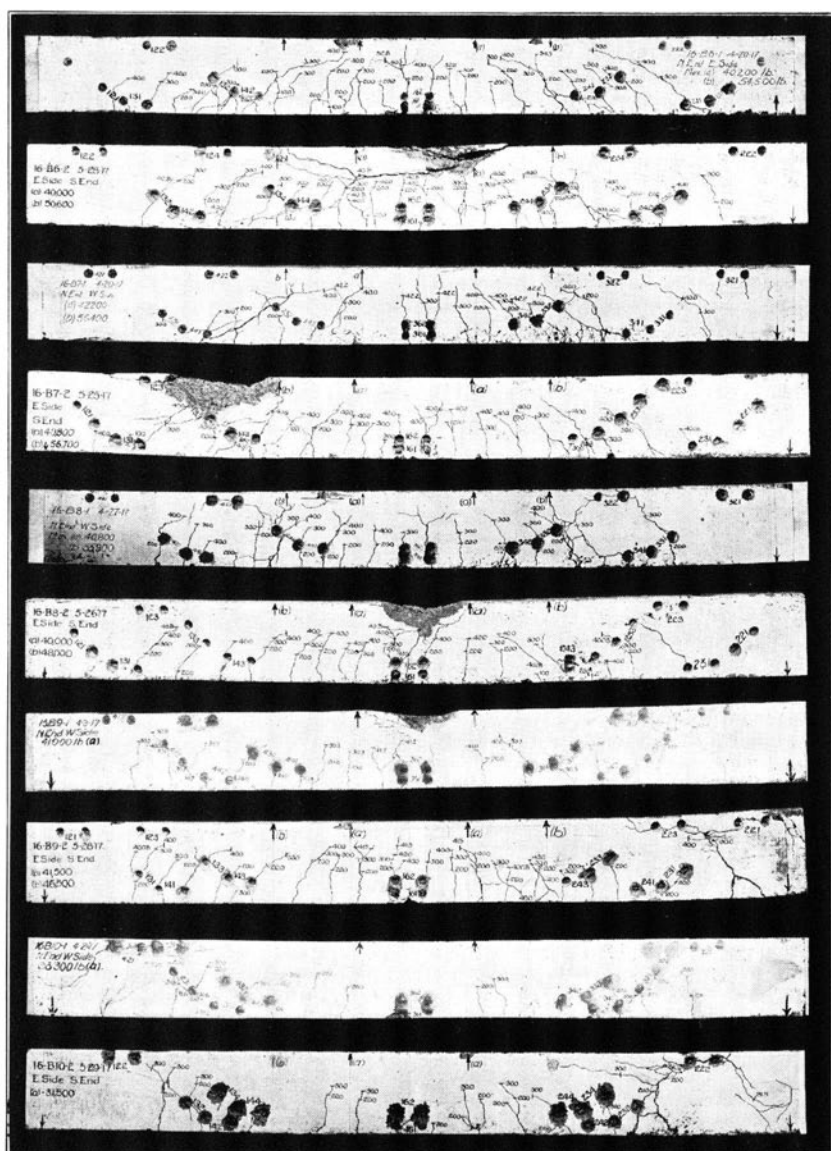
VIEWS OF BEAMS AFTER FAILURE, SERIES OF 1917
